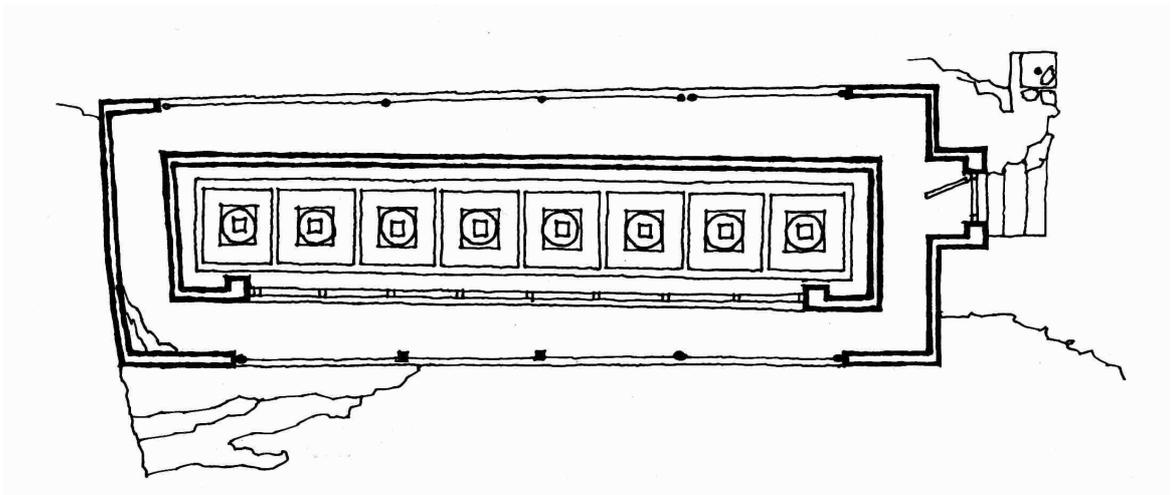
Floorplan of the 8 chörten building (drawing: John Harrison, 2010)
